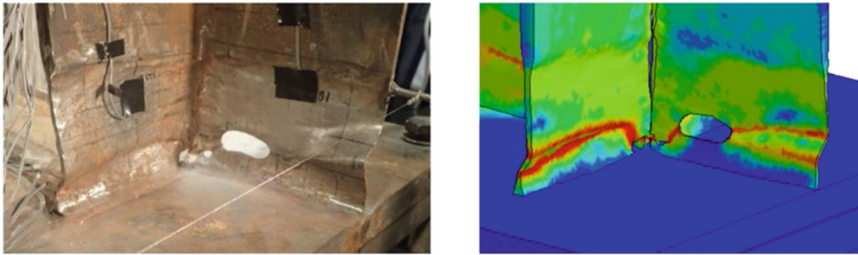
Failure mode of corroded girder (Zhang and Zaghi, 2023).
